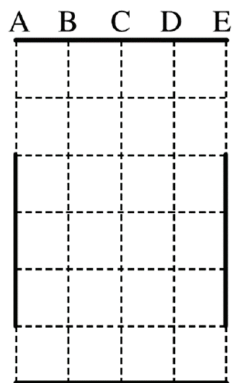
Baseline SDC D_{max} steel moment frame building typical 3-story plan.
